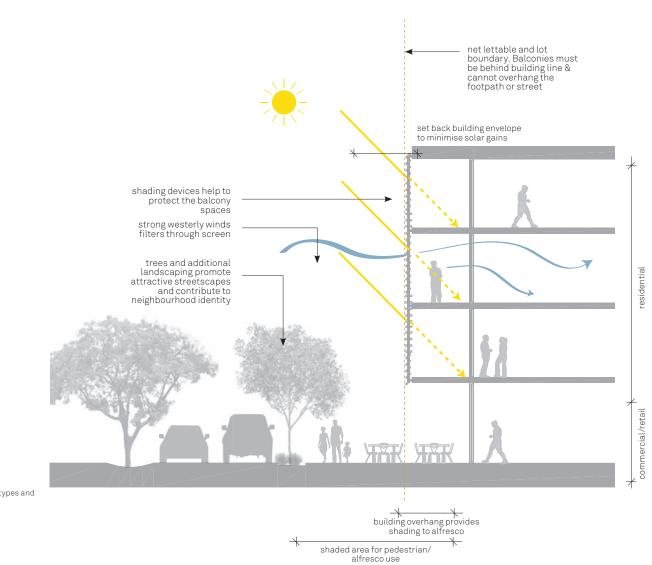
multi-residential/mixed use building types and shading as interstitial space
